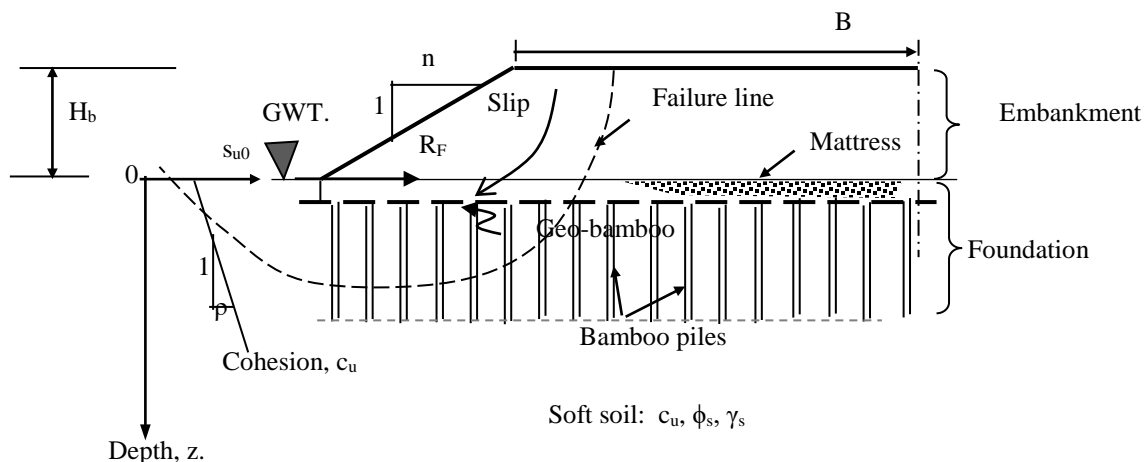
Cross-section slip circle failure of embankment on the soil foundation
